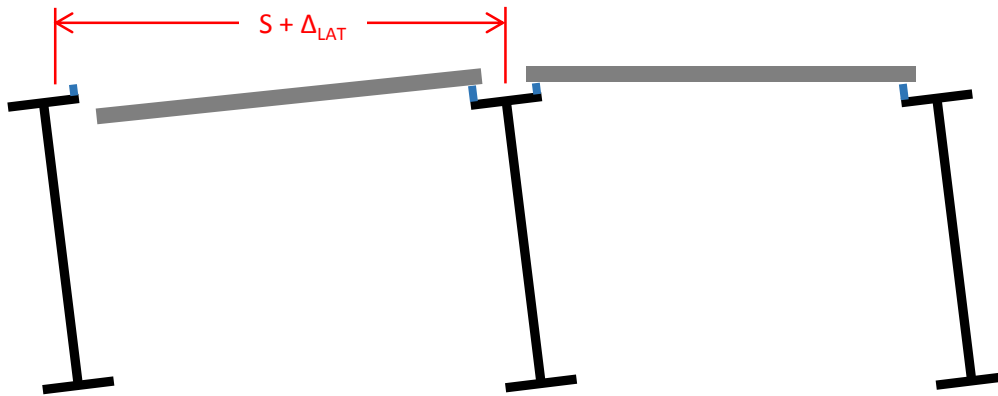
Separation of I-Girders During Construction away from Cross-Frame
